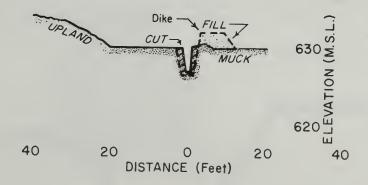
TYPICAL SECTION OF FLOODWATER DIVERSION
